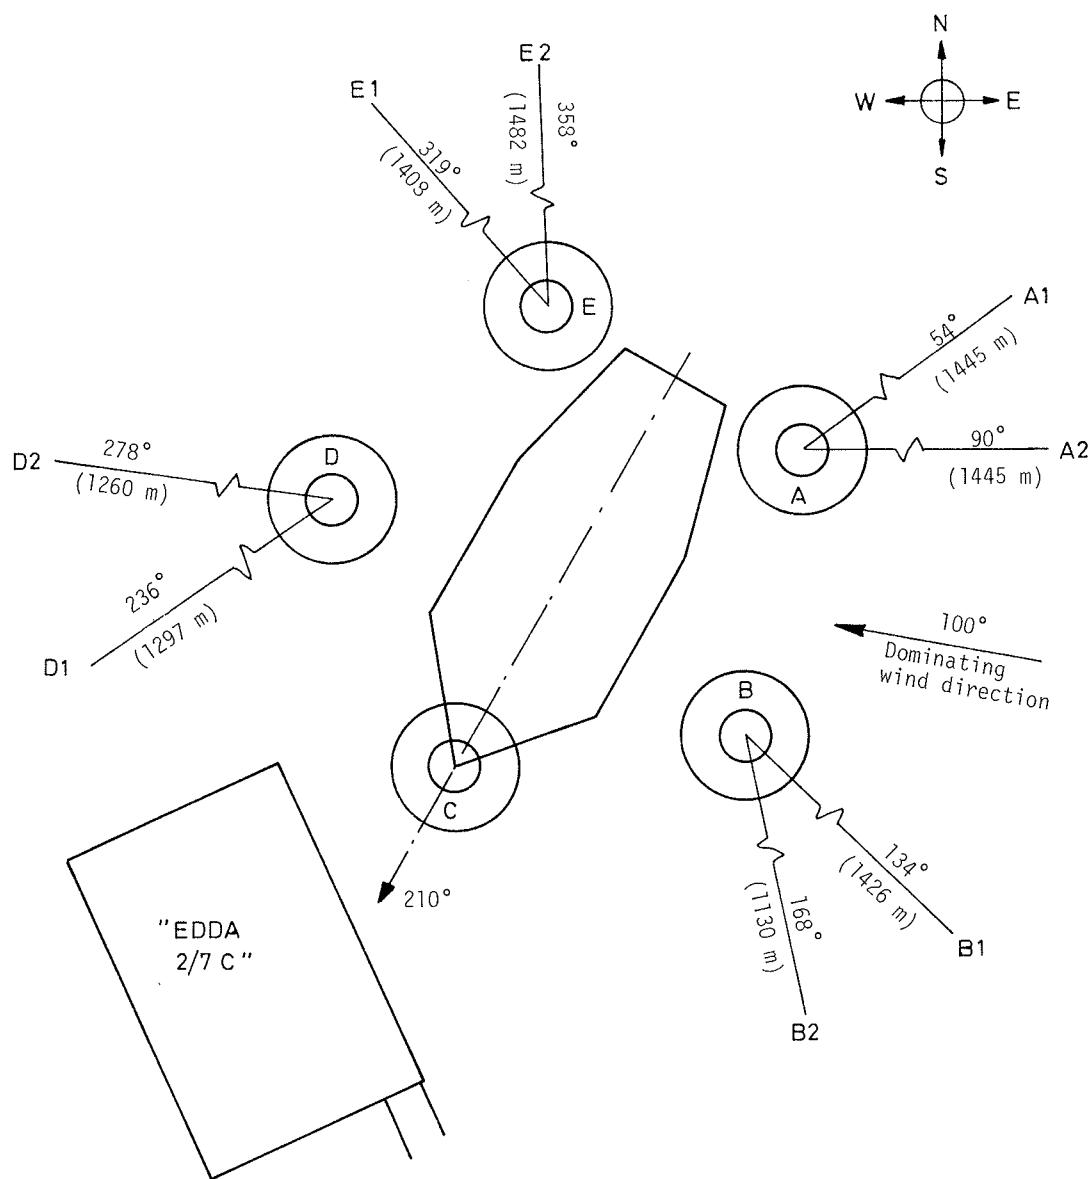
Anchor pattern used at the last anchoring near "EDDA 2/7 c"
